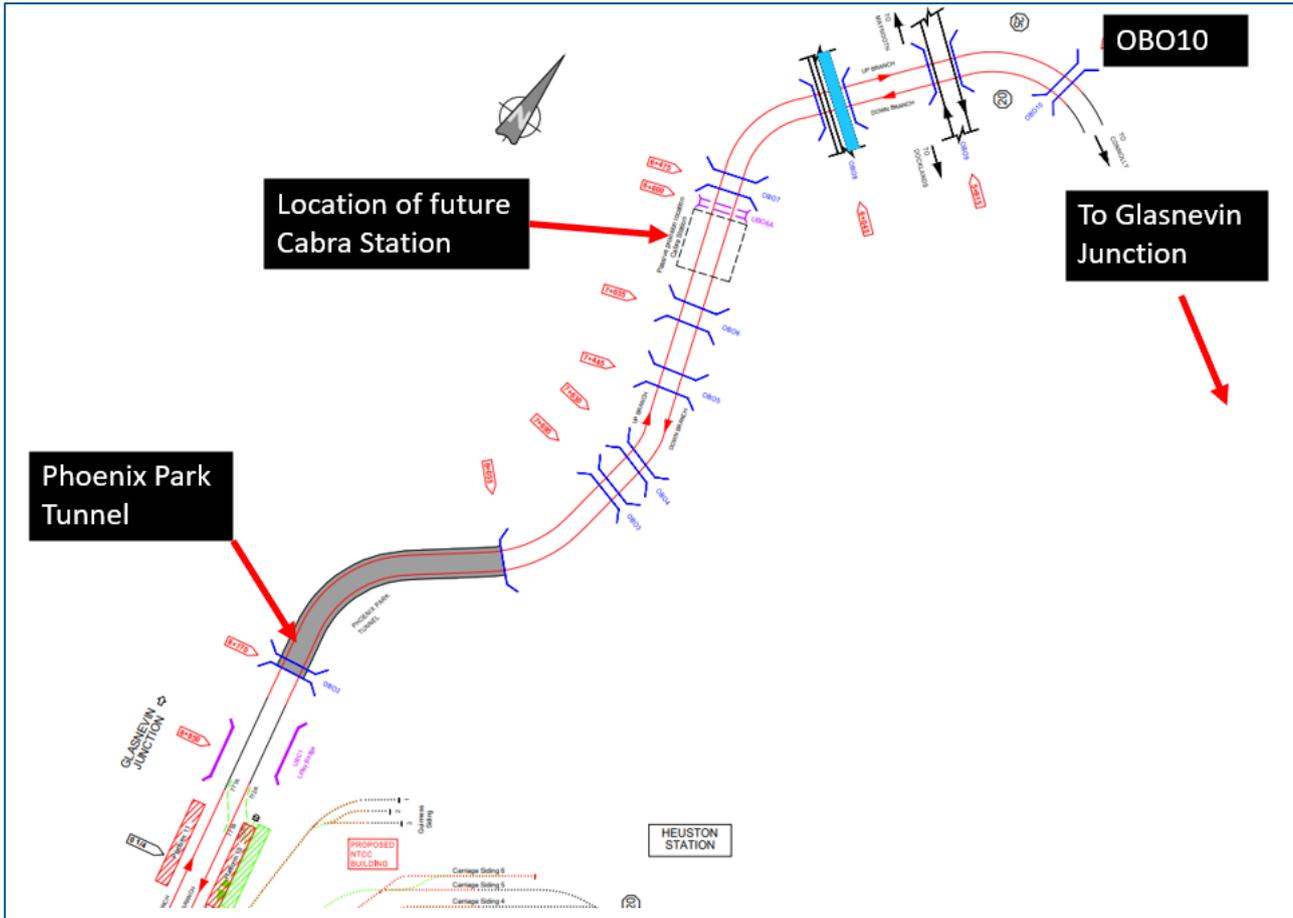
Phoenix Park Tunnel to Glasnevin Cemetery Road Bridge (OBO10) – Track Plan Layout
